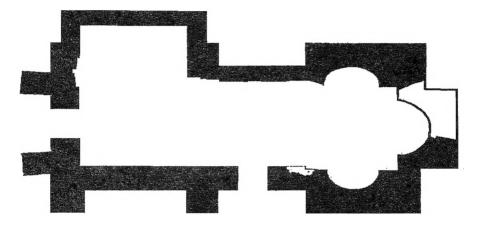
the Triconch at Tudence, floor plan (LILCHIK, 2003)
